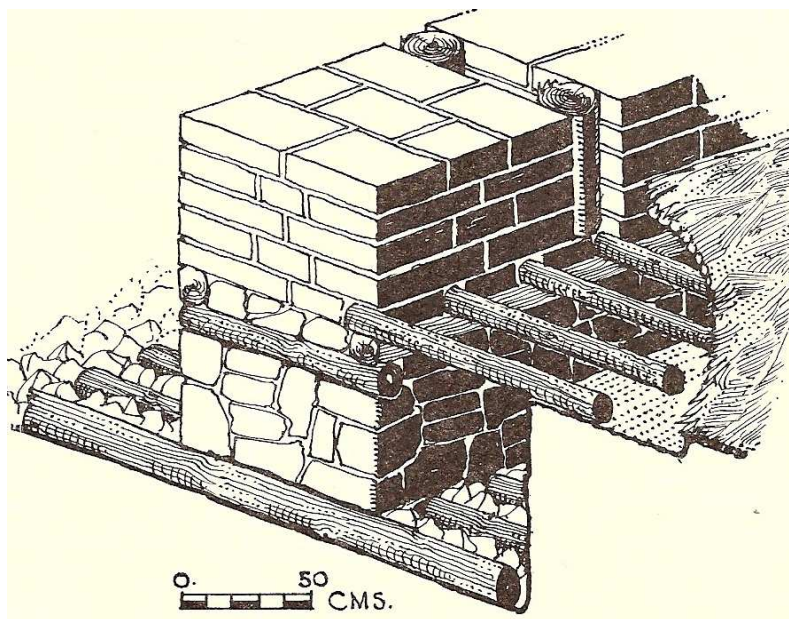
5 Wall construction of palace of Beycesultan (Naumann, R. 1985)
